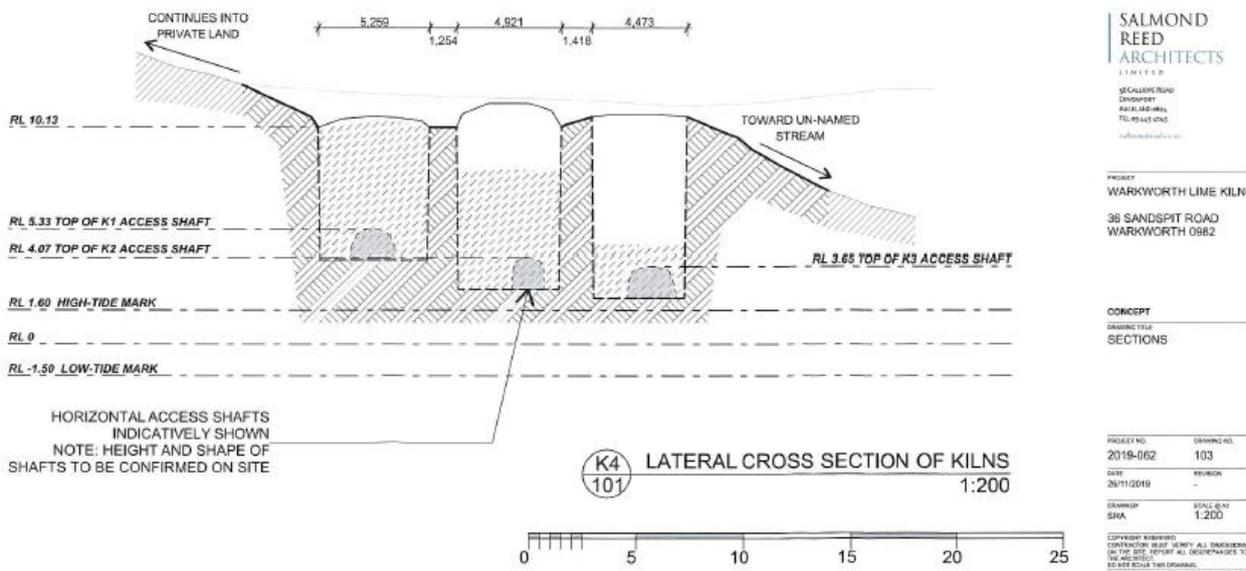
Lateral cross section plan of the kilns (Salmond Reed 2020)
